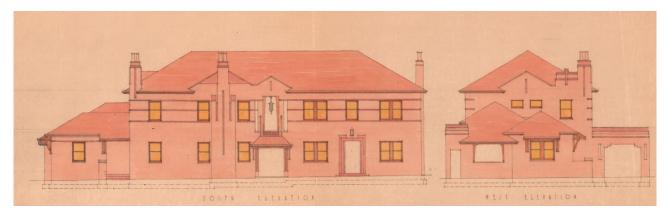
City of St Kilda building permit plans for 110 Westbury Street (No. 9831, 28 Nov. 1937). The front (west) elevation is at right, and the south side elevation at left. (Source: Council Building File)
